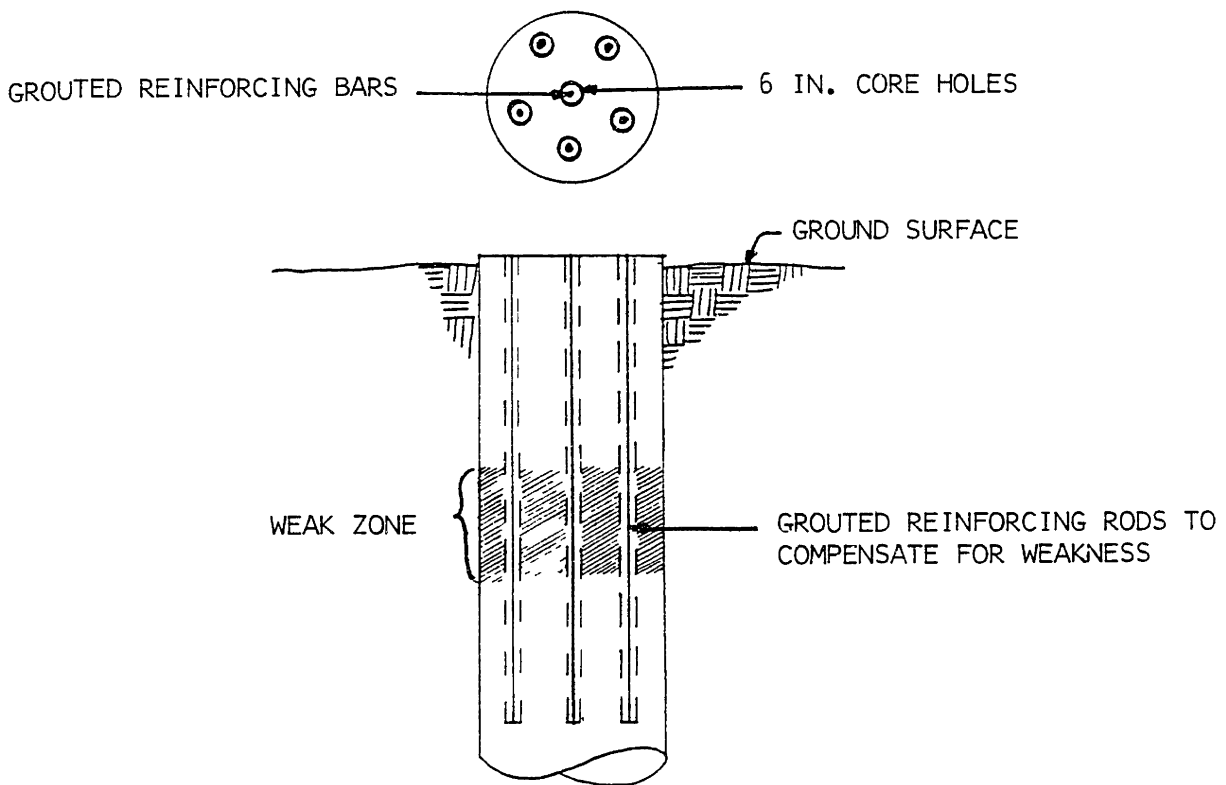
ADDITION OF REINFORCING BARS TO BRIDGE OVER WEAK ZONE (ADAPTED FROM BAKER AND KHAN 1971)
